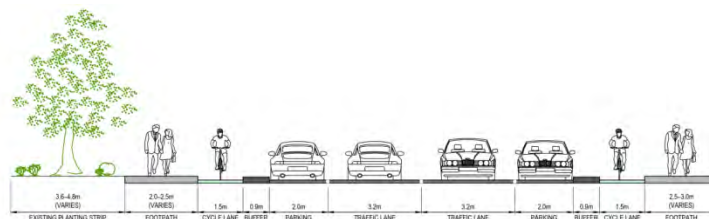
Cross Section 1 – Recommended residential cross section for the short-term upgrades (between Dee Street and the north side of the town centre, and between Trent Street and Reef Street)
